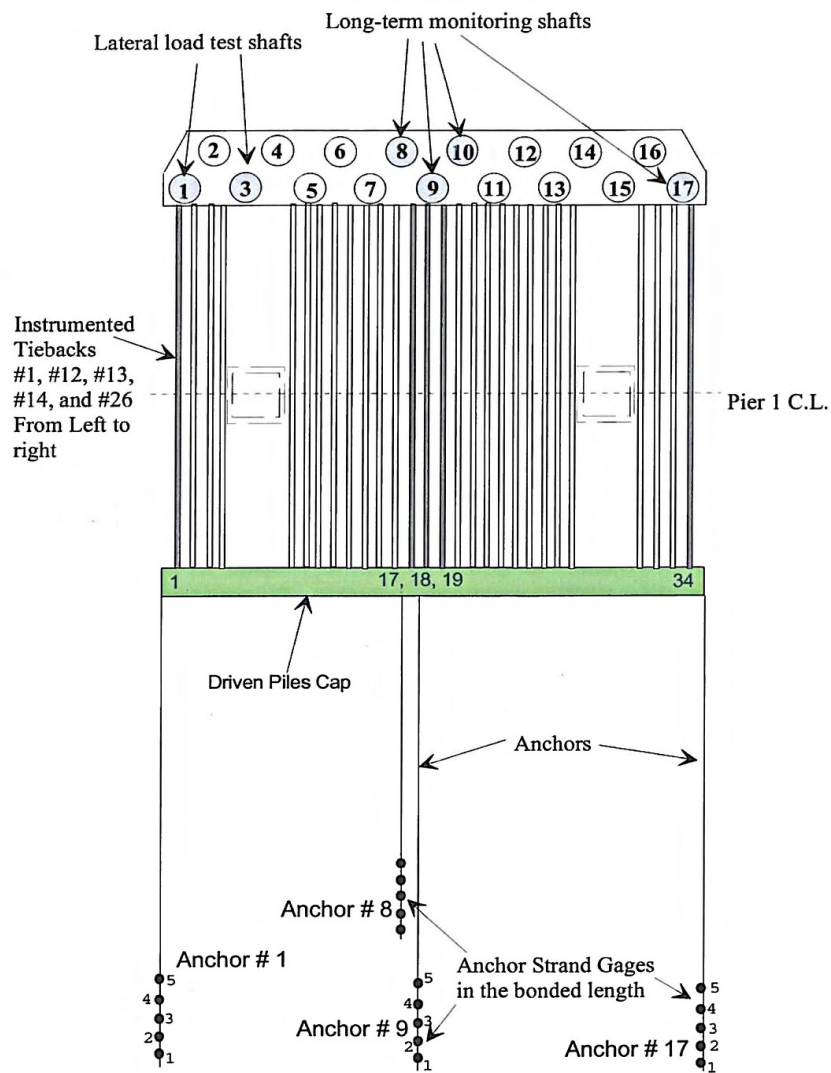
Plan of the stabilization system showing the locations of the instrumented foundation elements.
